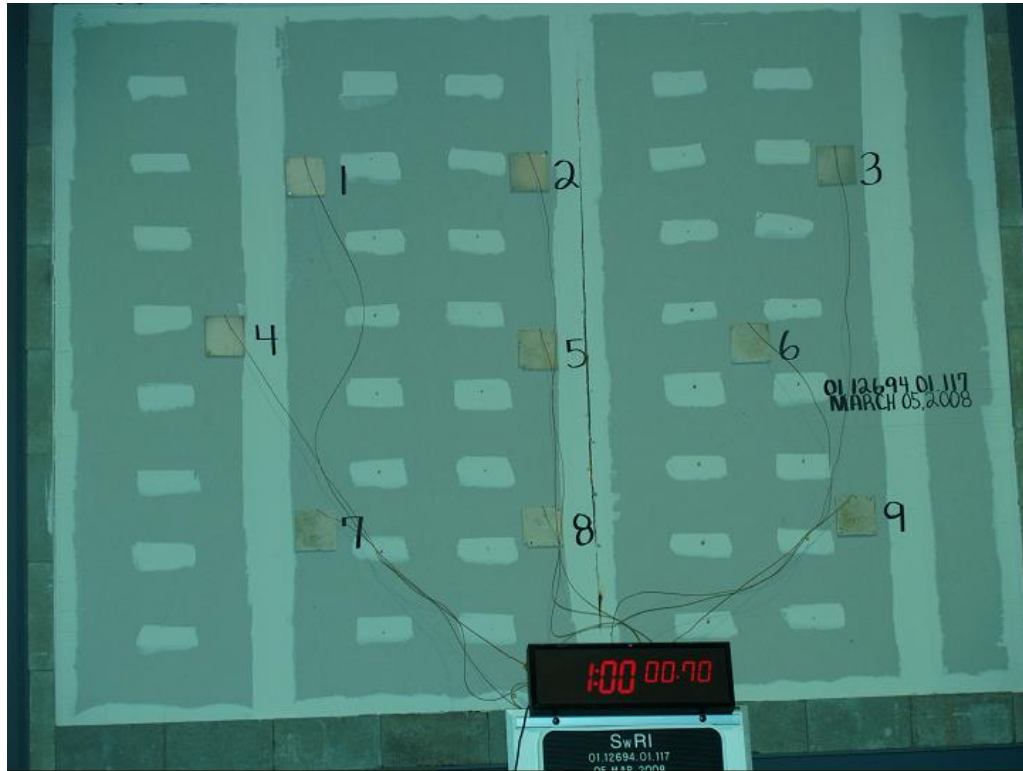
Unexposed Face of Fire Test Wall at end of Furnace Exposure.
